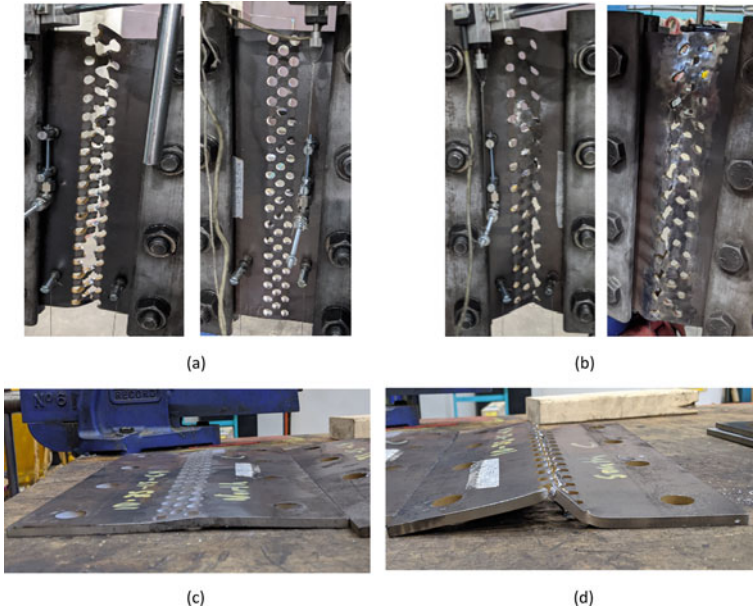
Sample in-plane deformed shapes of south and north specimens in cyclic tests a 10-3S-15-6.4 and b 10-3S-20-6.4; out-plane deformation of 10-3S-15-6.4 specimen c north, and d south specimens
